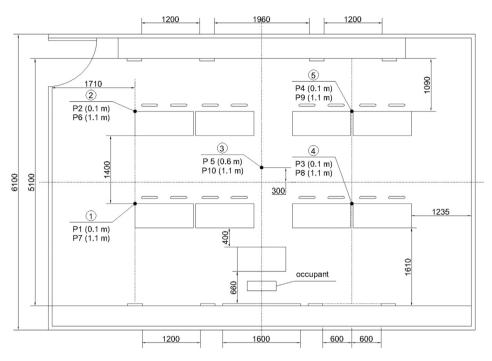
Plan view of measurement positions (mm) for stratum ventilation and mixing ventilation at 0.1 m, 0.6 m and 1.1 m levels.
